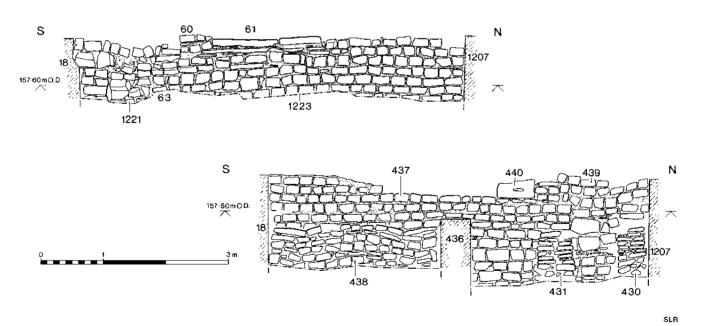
Elevation J: exterior elevation of east wall of Building 197; Elevation K: interior elevation of west wall of Building 197 (for location see Fig 70)
